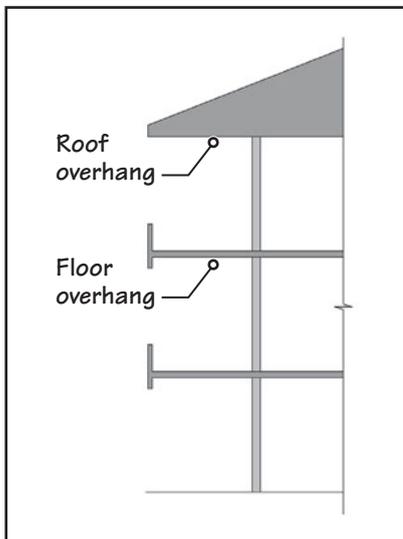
Deep roof and floor overhangs can substantially reduce water leakage from wind-driven rain through walls.
